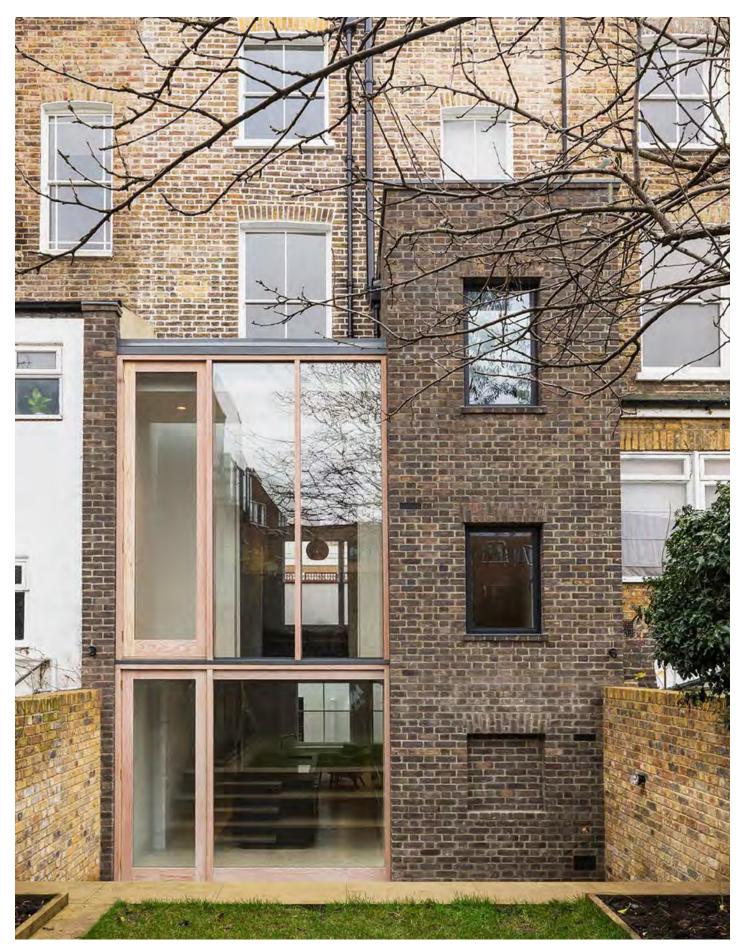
Example of a two-storey rear extension of a terraced house designed by Gundry+Ducker Arch. that infills between existing extensions and outriggers, refer to Section 4.16 for guidance. This scheme also features a well-designed parapet detail to the roof (refer to Section 4.15) and concealed rainwater goods (refer to Section 2.24) giving a clean appearance. (Photo: Andrew Meredith)
